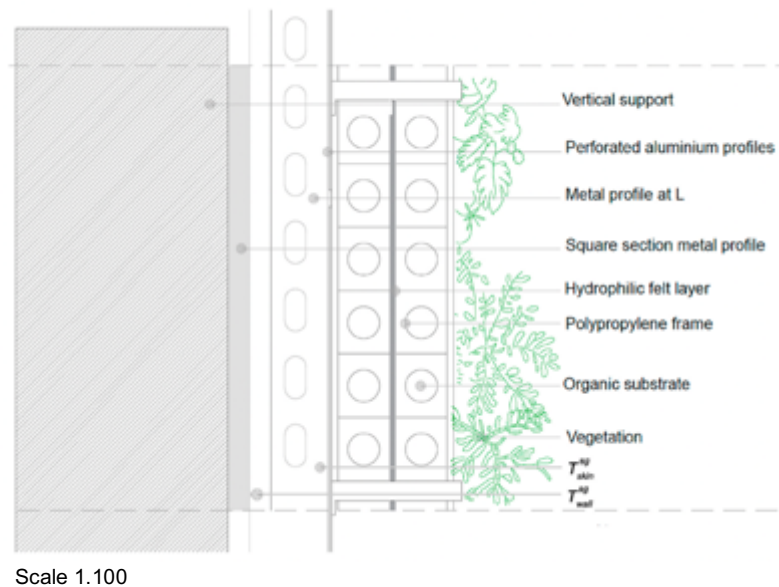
Modular vertical gardening system installed in the itdUPM building.
